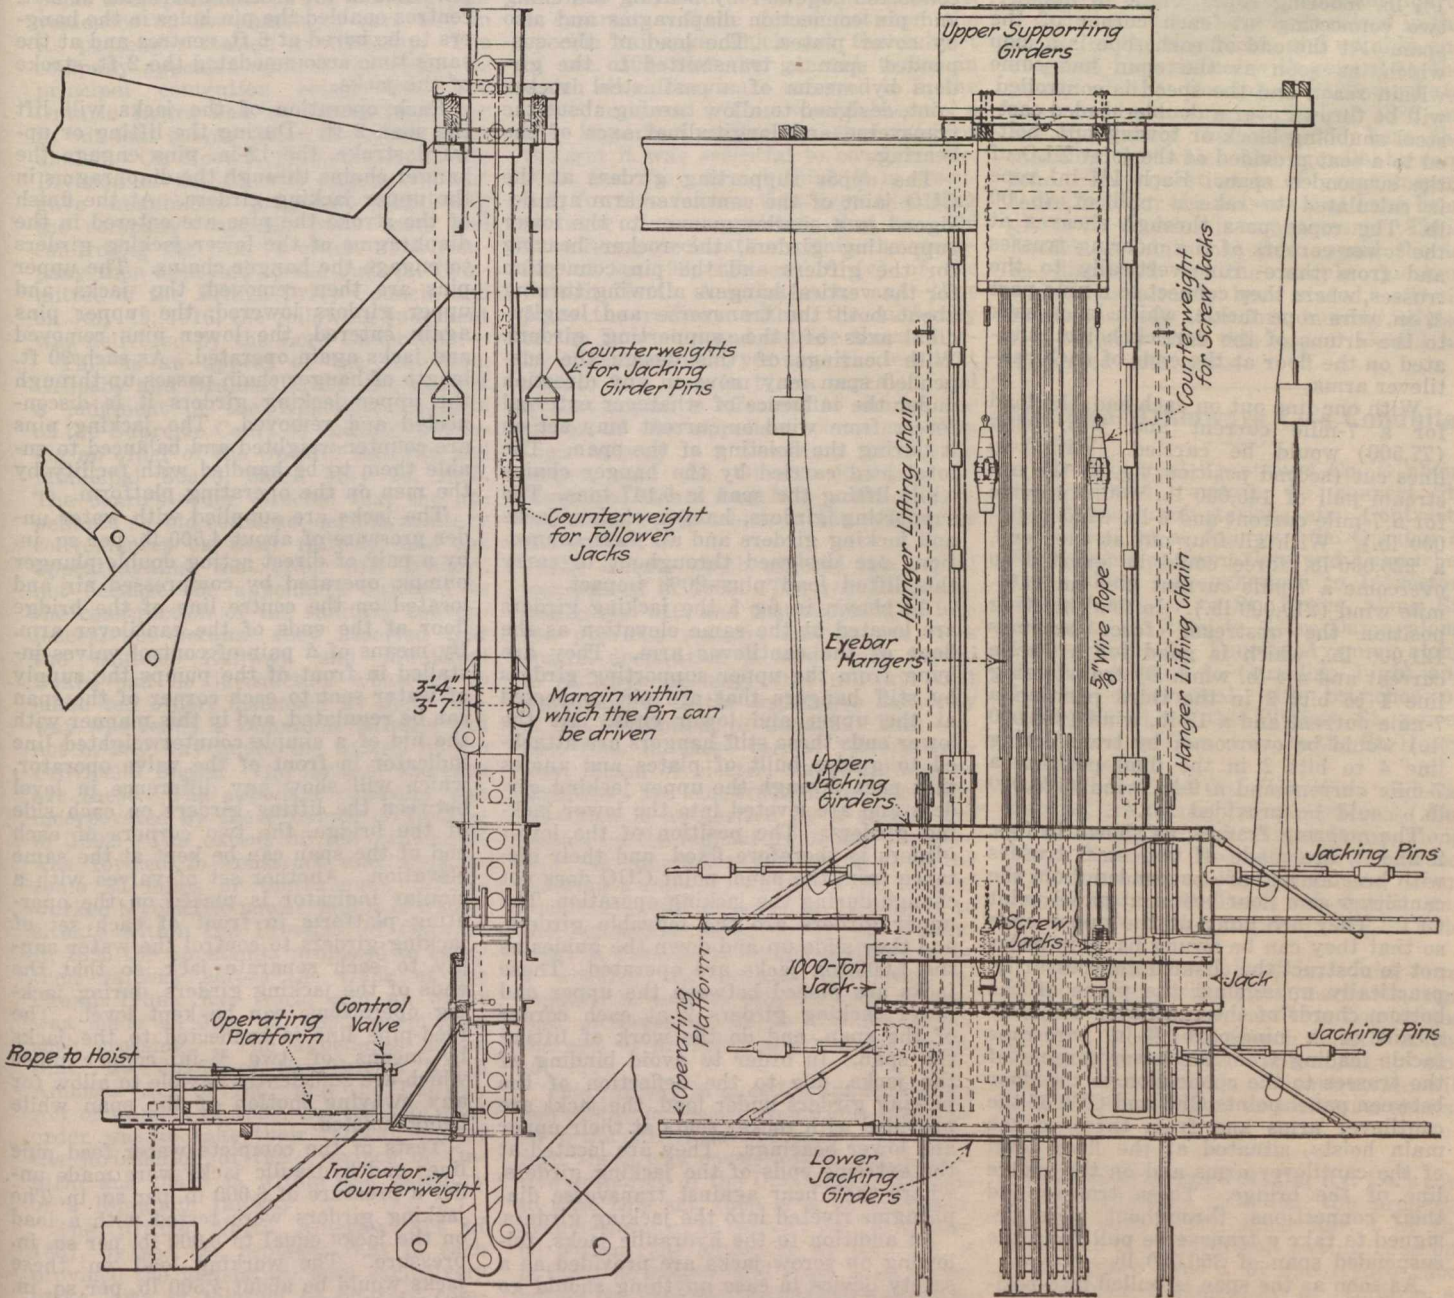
Jacking equipment for hoisting suspended span, Quebec Bridge.
